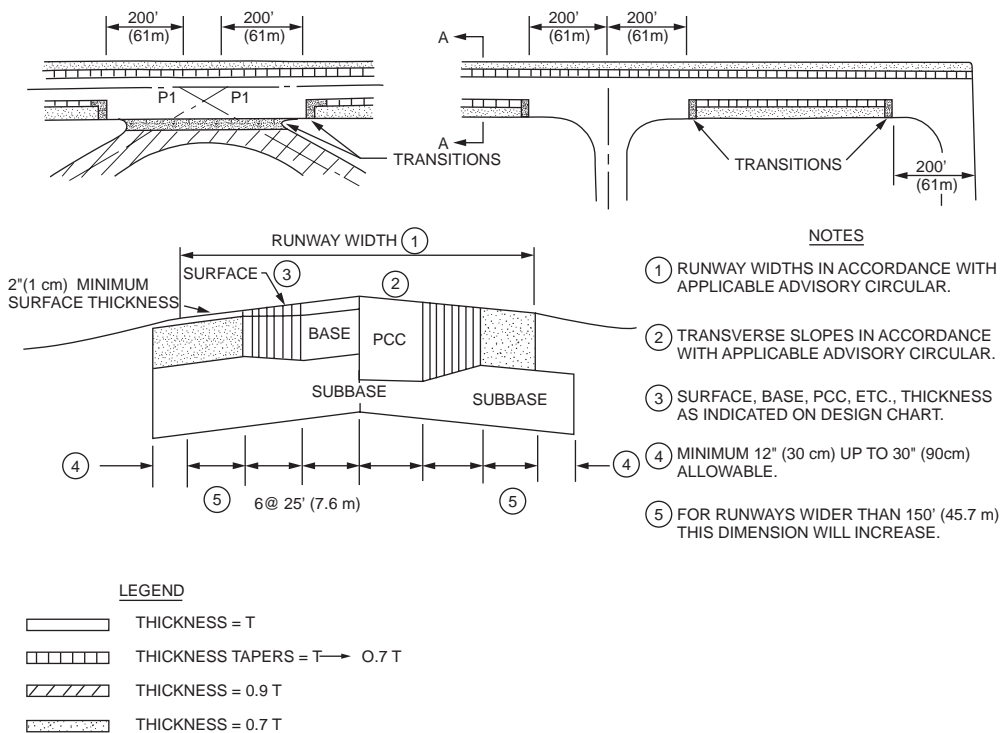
Typical plan and cross section for runway pavements. (Source: Federal Aviation Administration, 1978. *Airport Pavement Design and Evaluation*. Advisory Circular AC No. 150/5320-6C, p. 35. With permission.)
